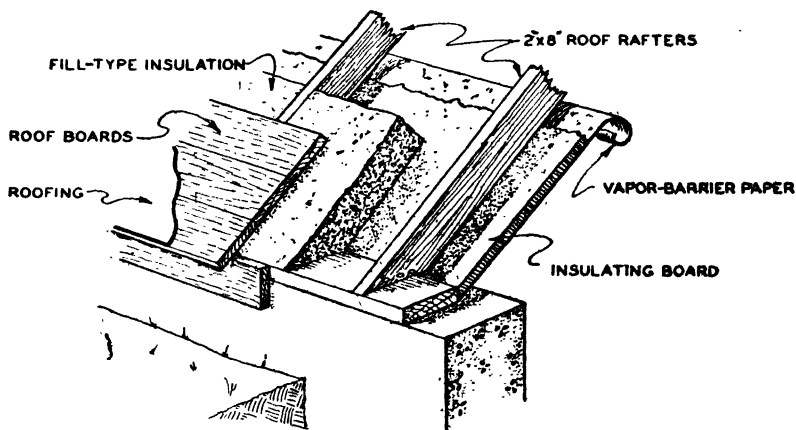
Fill-Type Insulation Applied over Insulating Board between Rafters of Roof of Below-Grade Vegetable Storage
